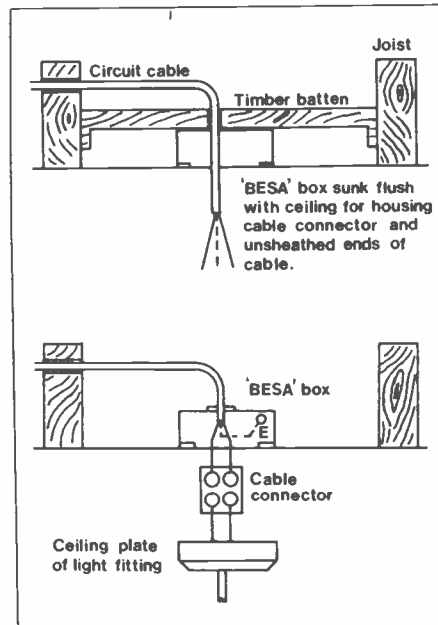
Fixing a light pendant fitting other than a ceiling rose.
